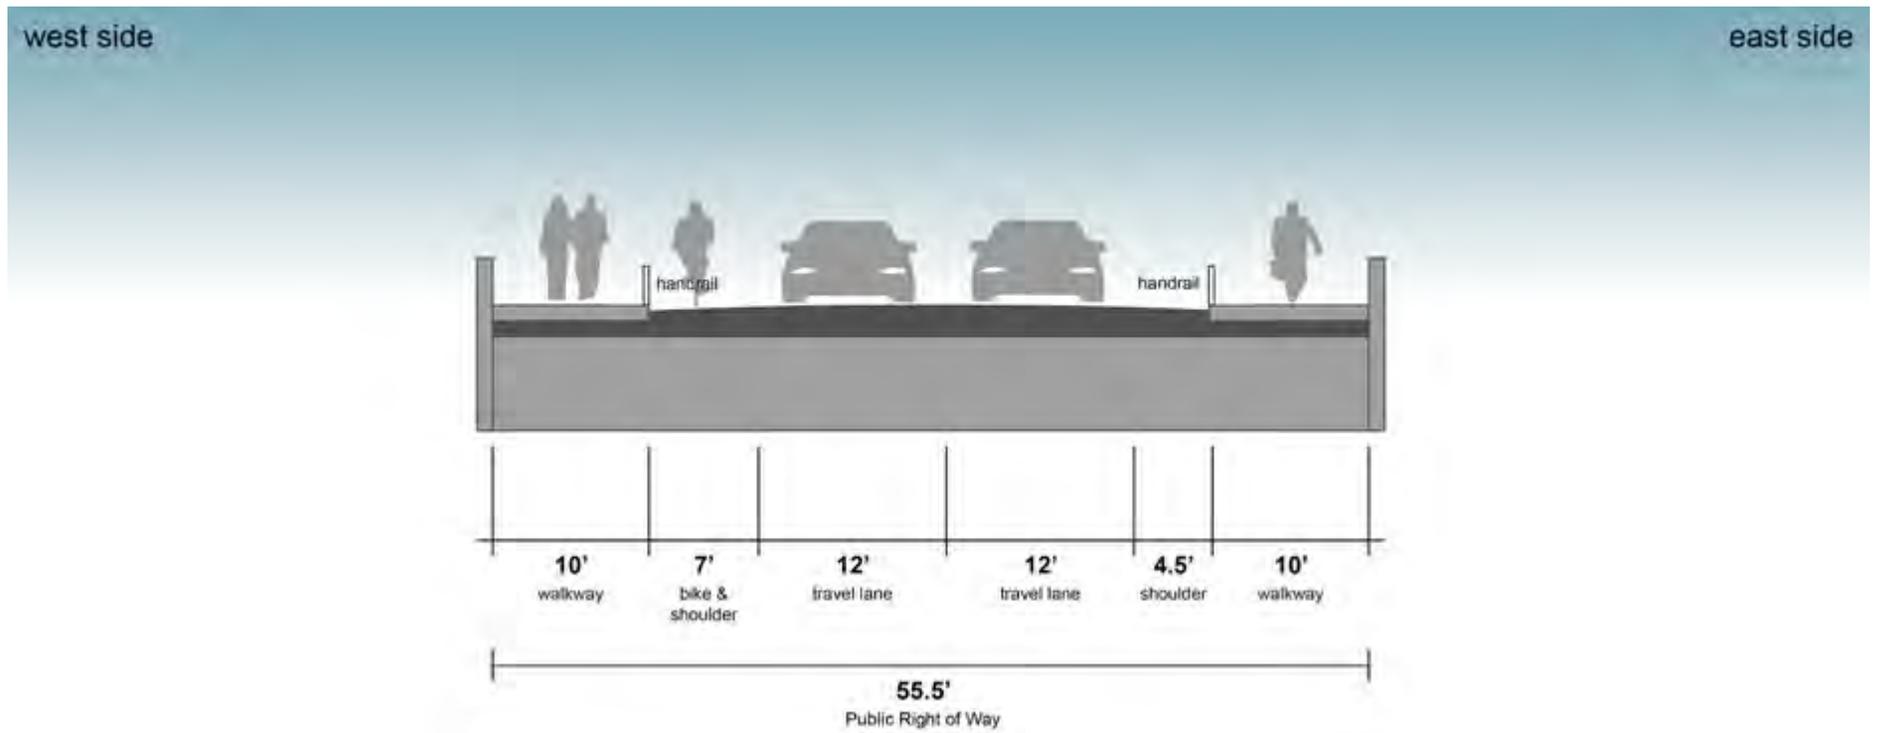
SECTION L: SQUAW VALLEY ROAD BRIDGE
